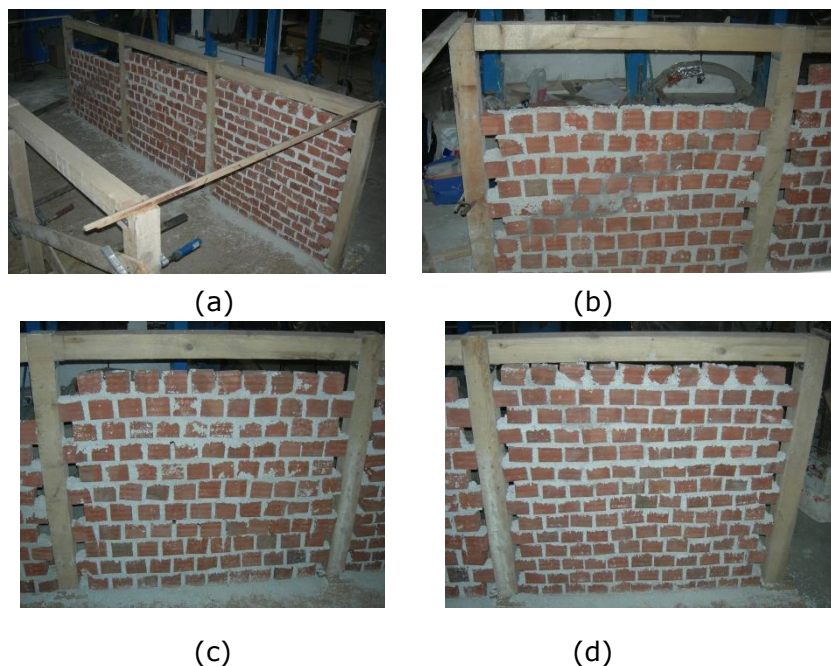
(a) General view of walls, (b) first wall, (c) second wall and (d) third wall
